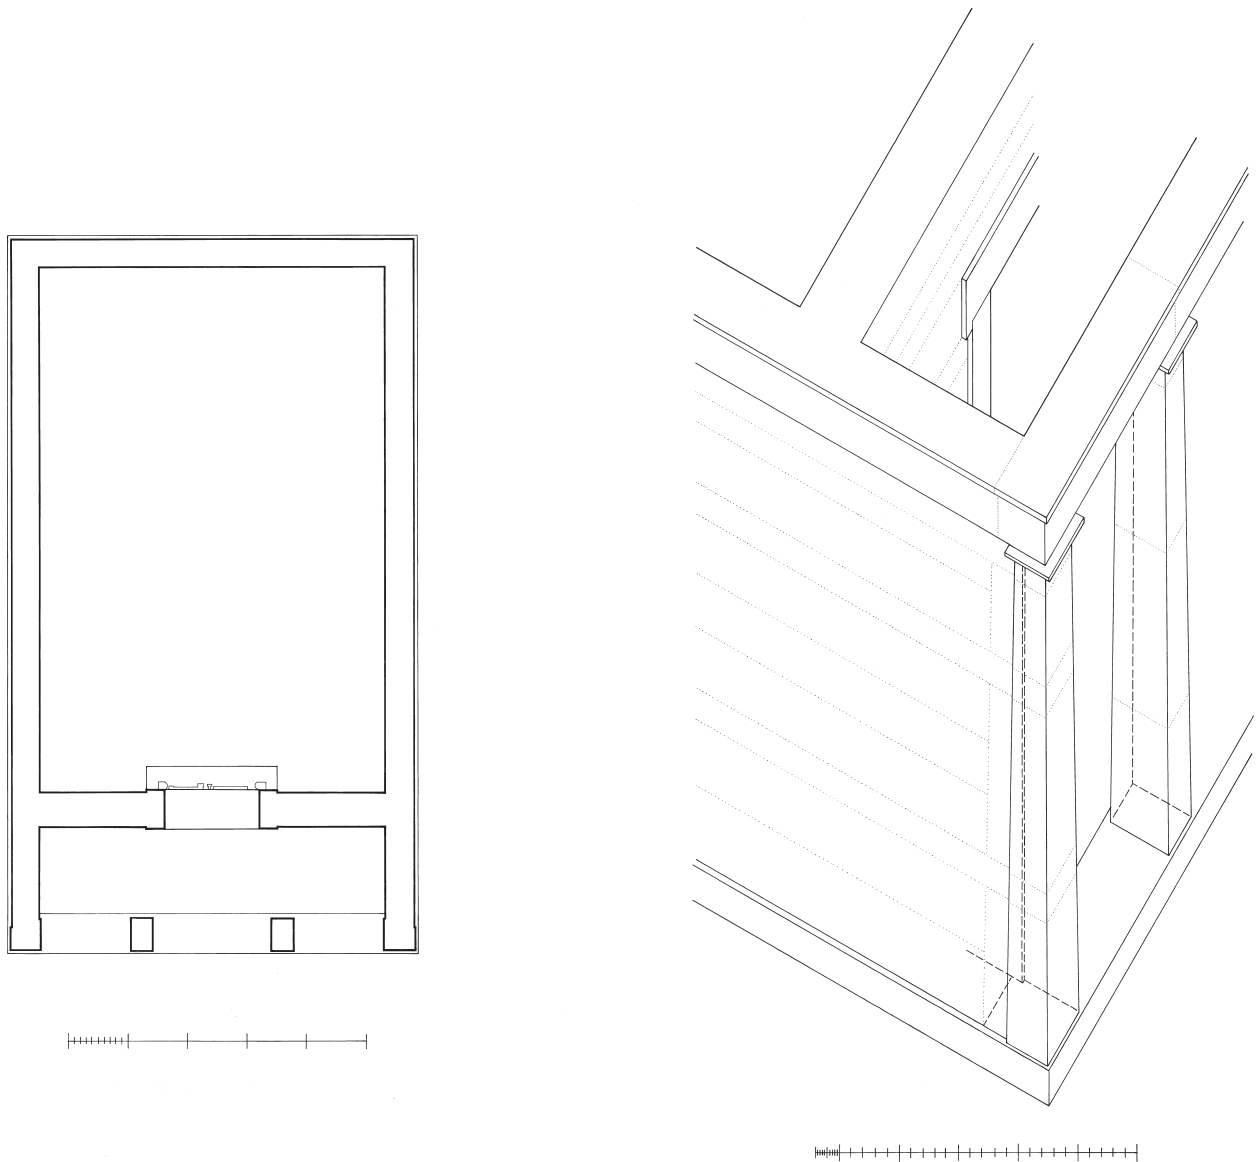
Building 3. Plan and reconstruction sketch. Drawing Yong K. Kim.
